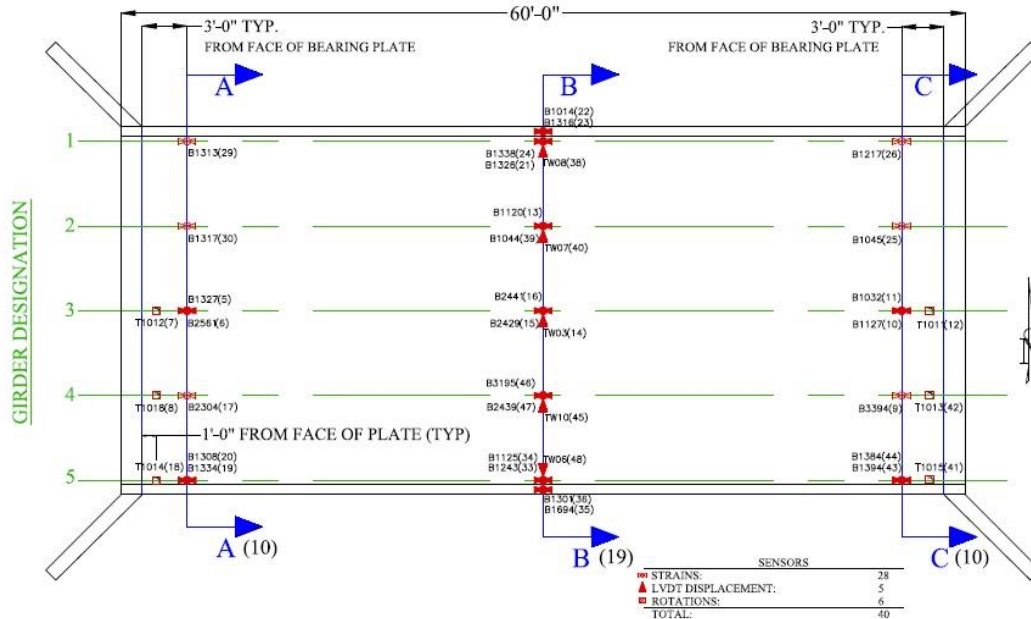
Sensor layout plan (Bridge Diagnostics, Inc., 2012)
